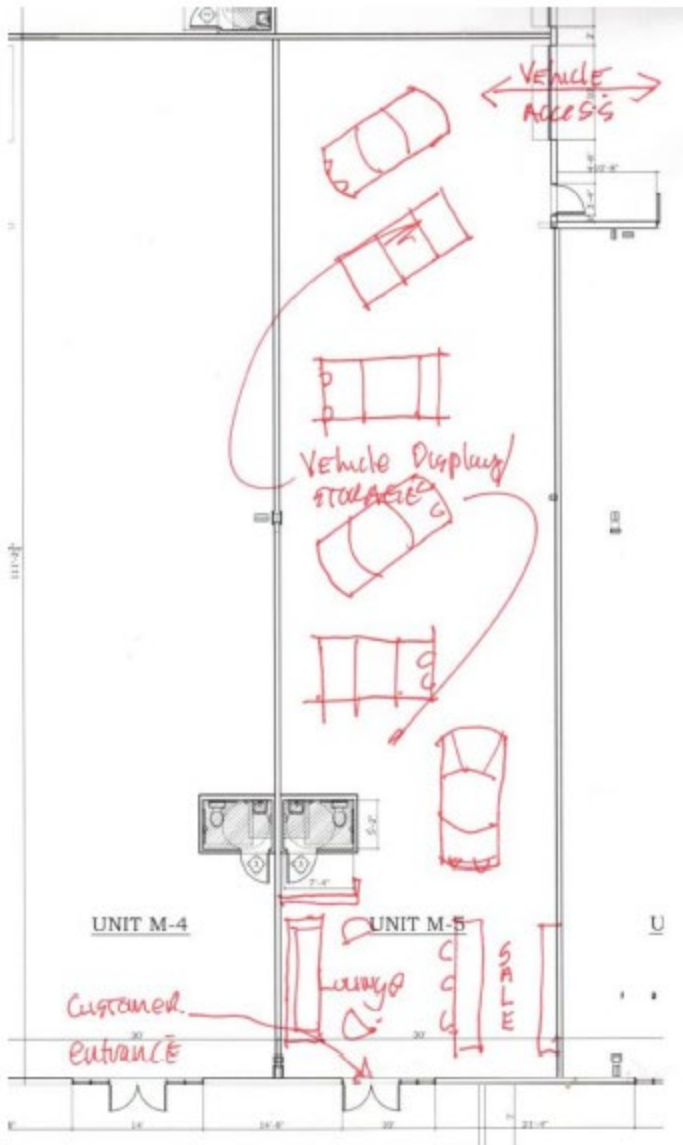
Proposed Floor Plan Source: Applicant’s Neighborhood Meeting PowerPoint
